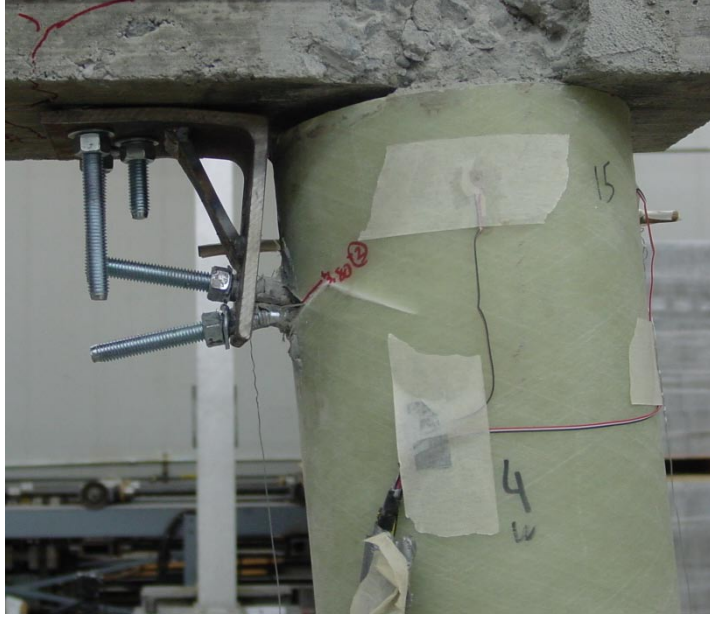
(a): Crack appeared at FRP tube as bolts fixing the steel angle to the upper column-segment of southern column of specimen F-FRP3-S were pulled out of position after 3.80 in. displacement level
